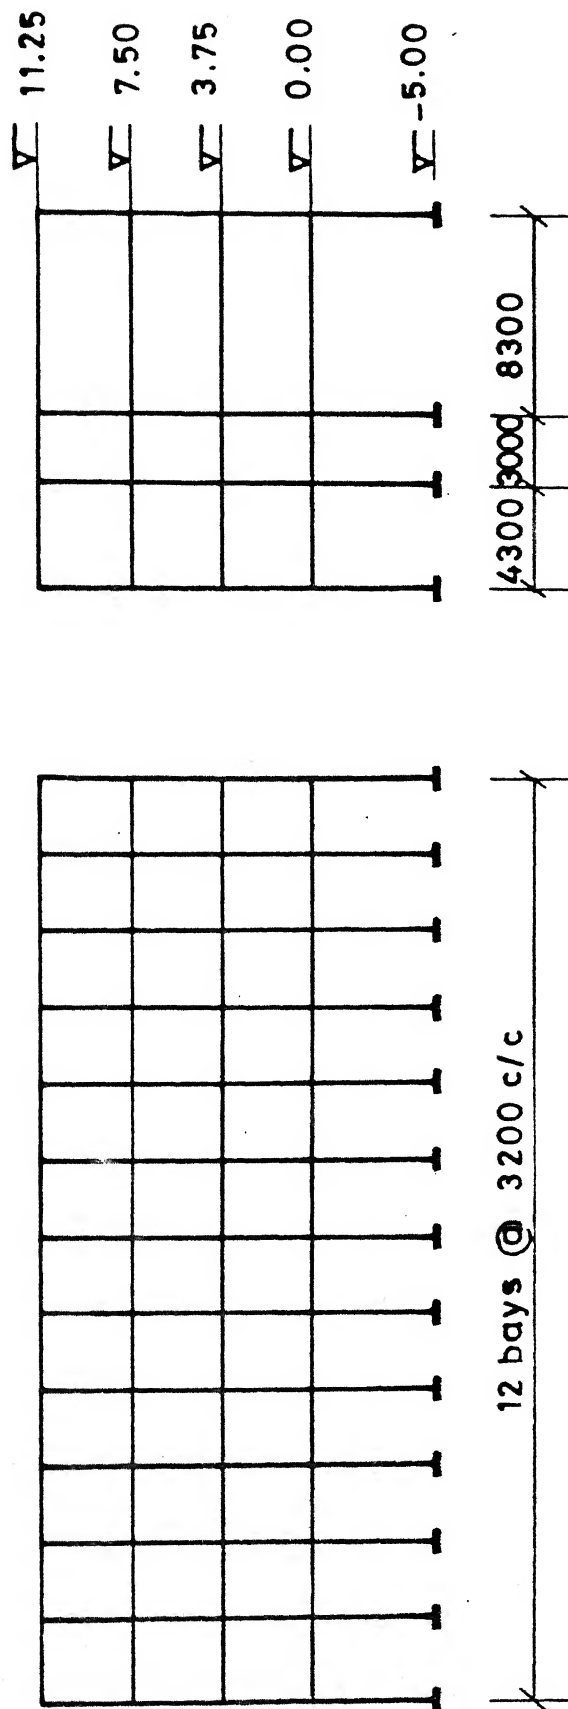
FLOOR PLAN FOR THE INSTITUTIONAL BUILDING.
